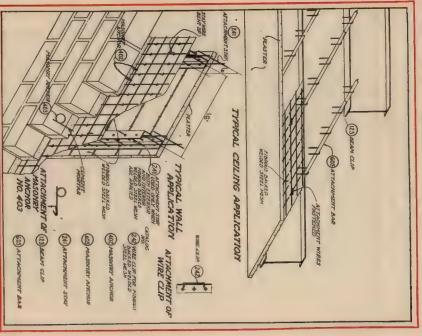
Methods of attaching fibrous-backed wire fabrics
